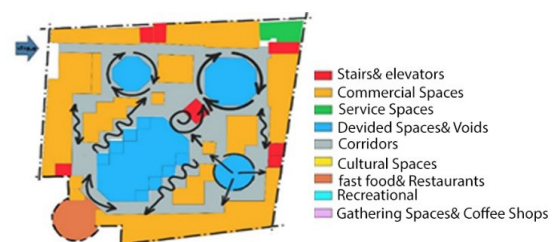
Schematic plan of the second floor of Tiraje. Authors.
